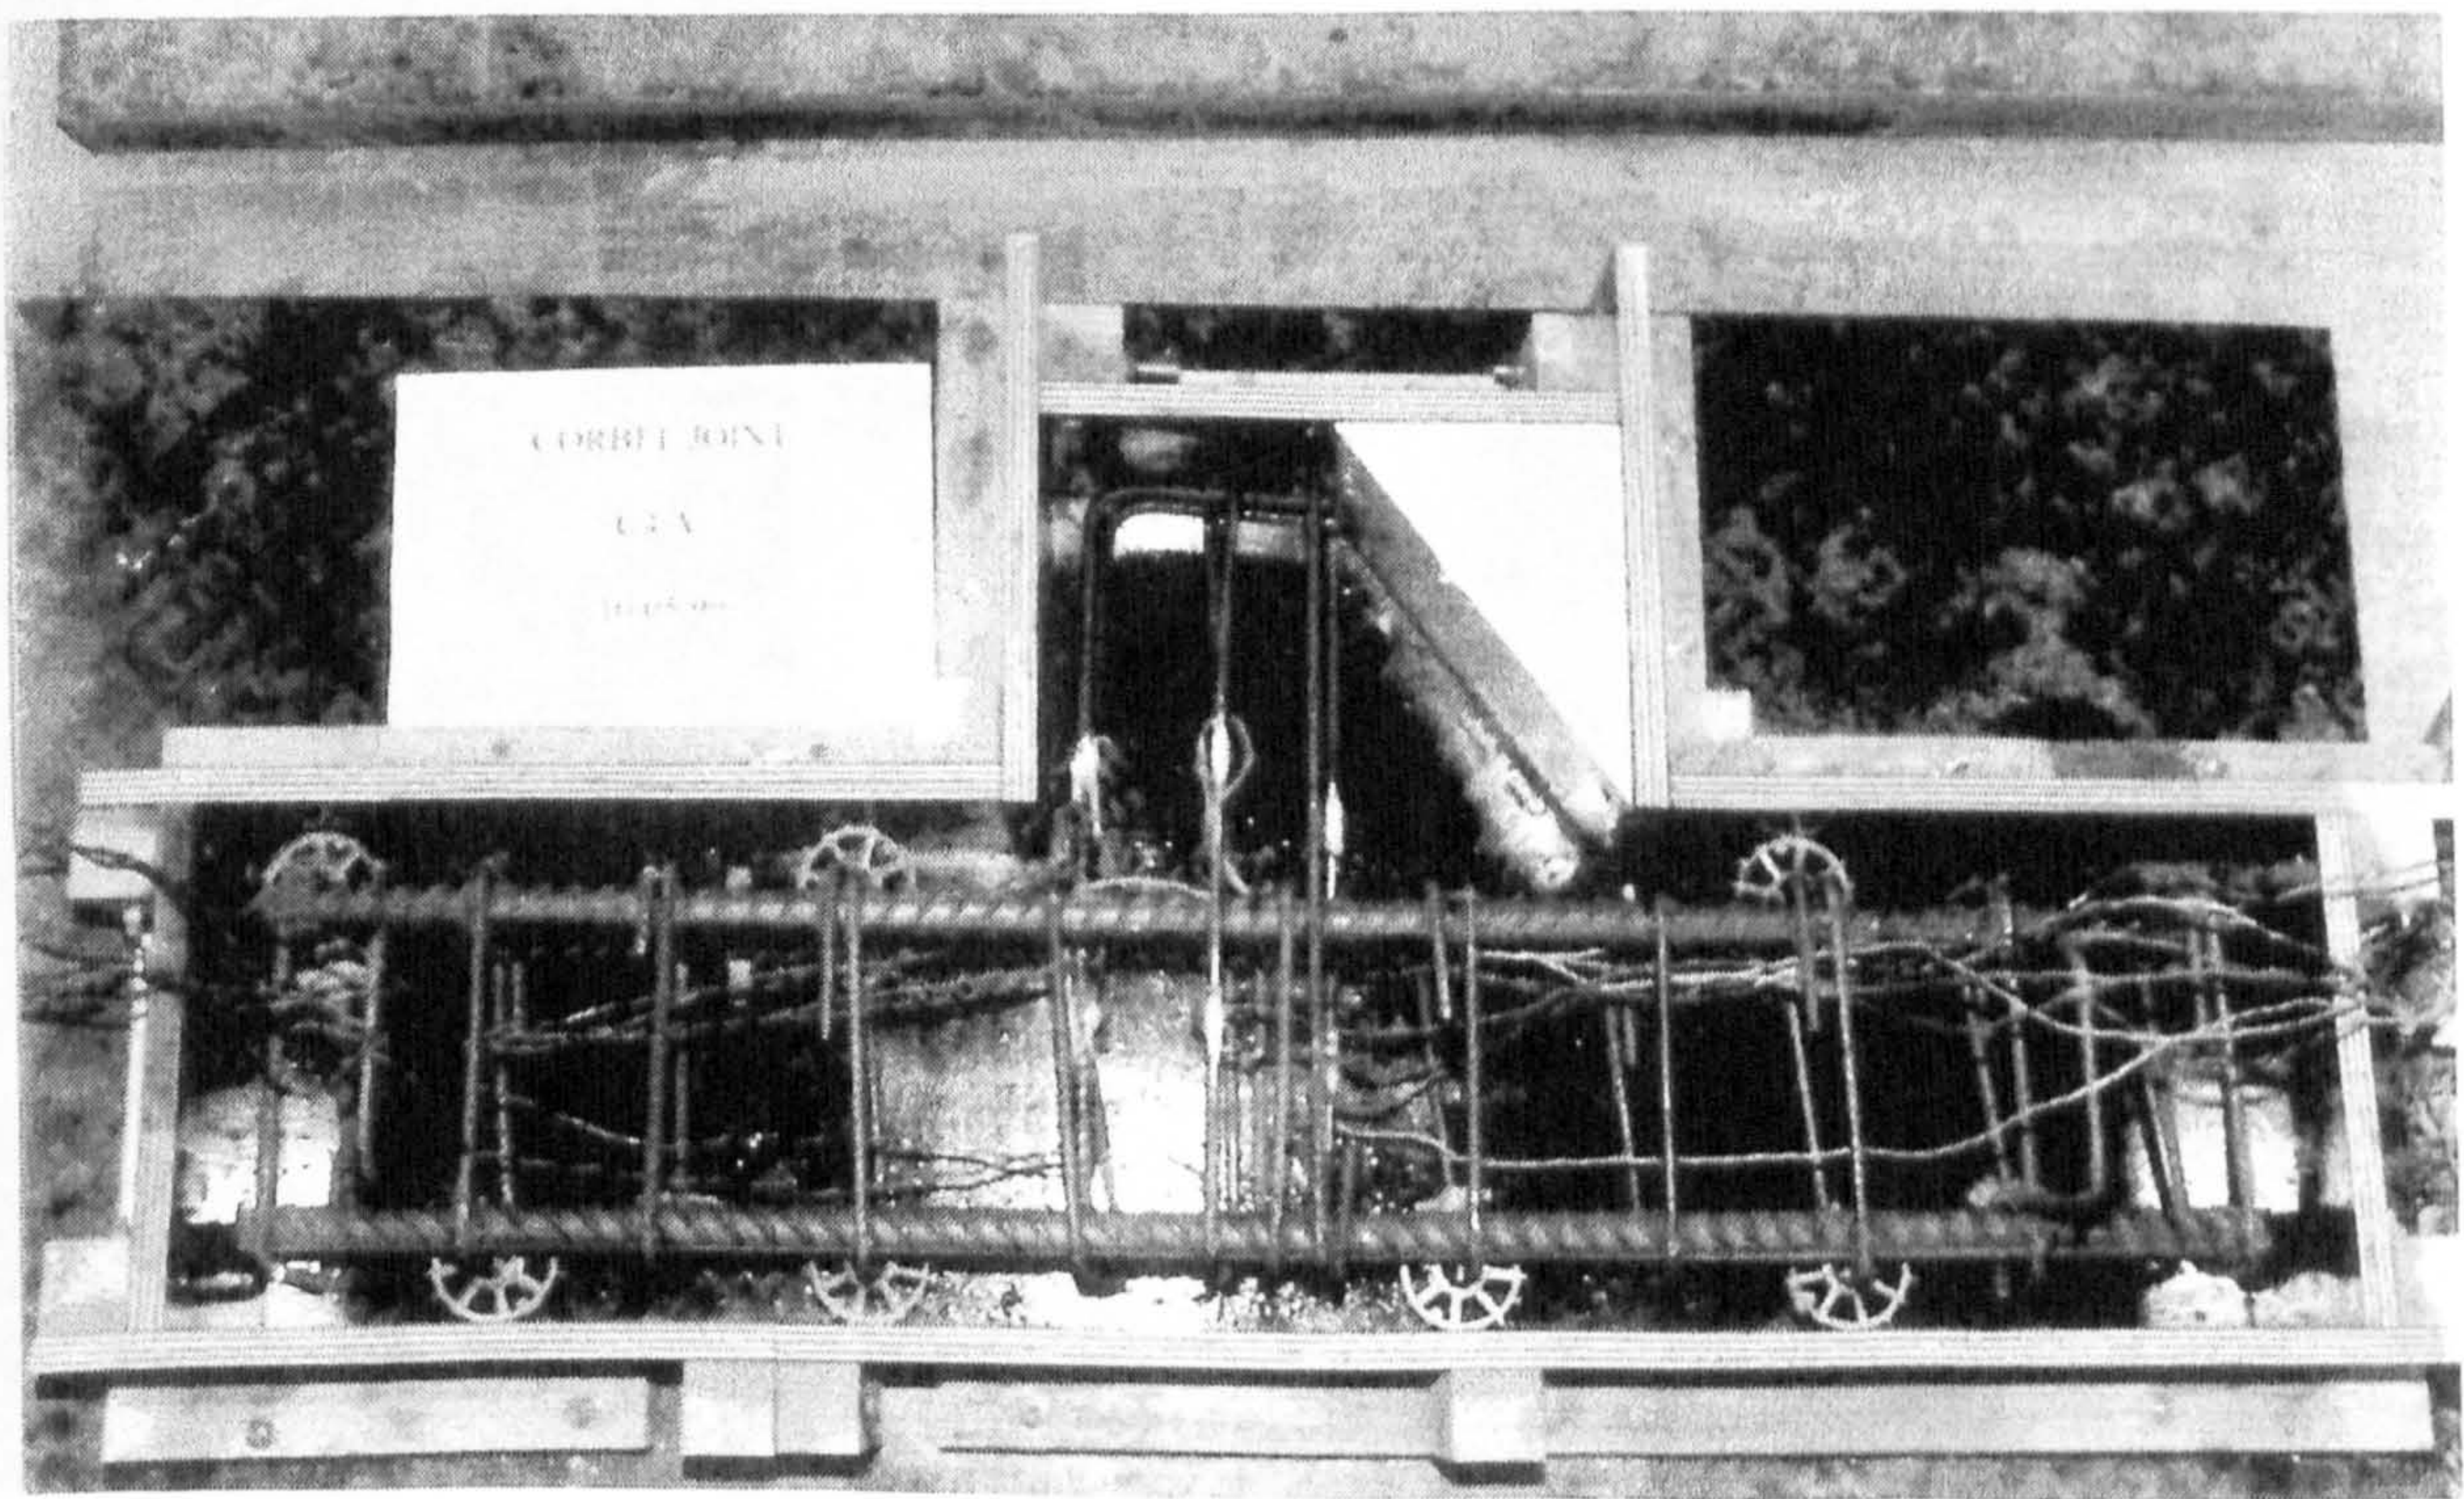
(b) Corbel C4A: Reinforcement Layout & Formwork
